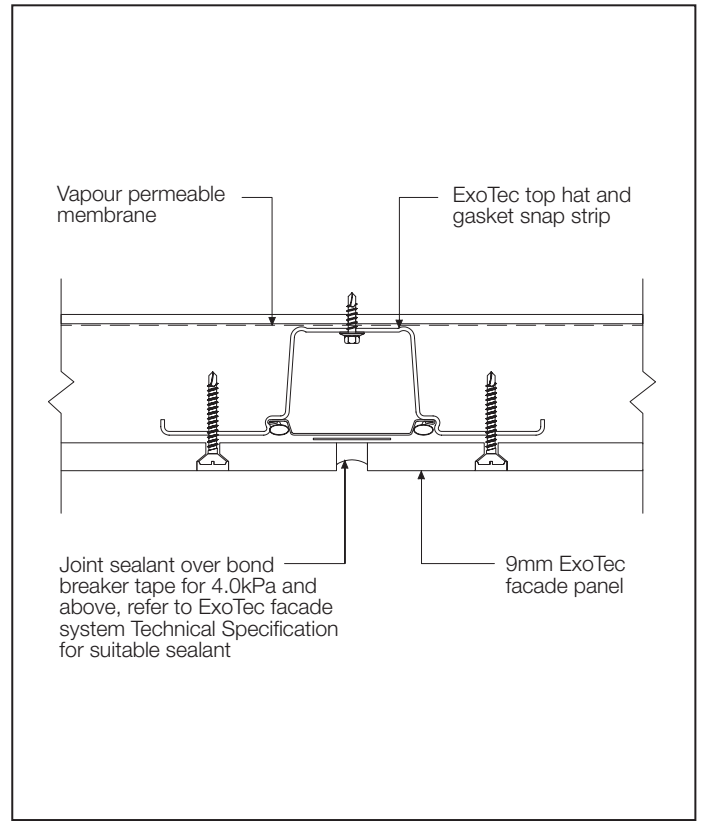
PANEL JOINTS IN HIGH WIND LOAD AREAS DETAIL
